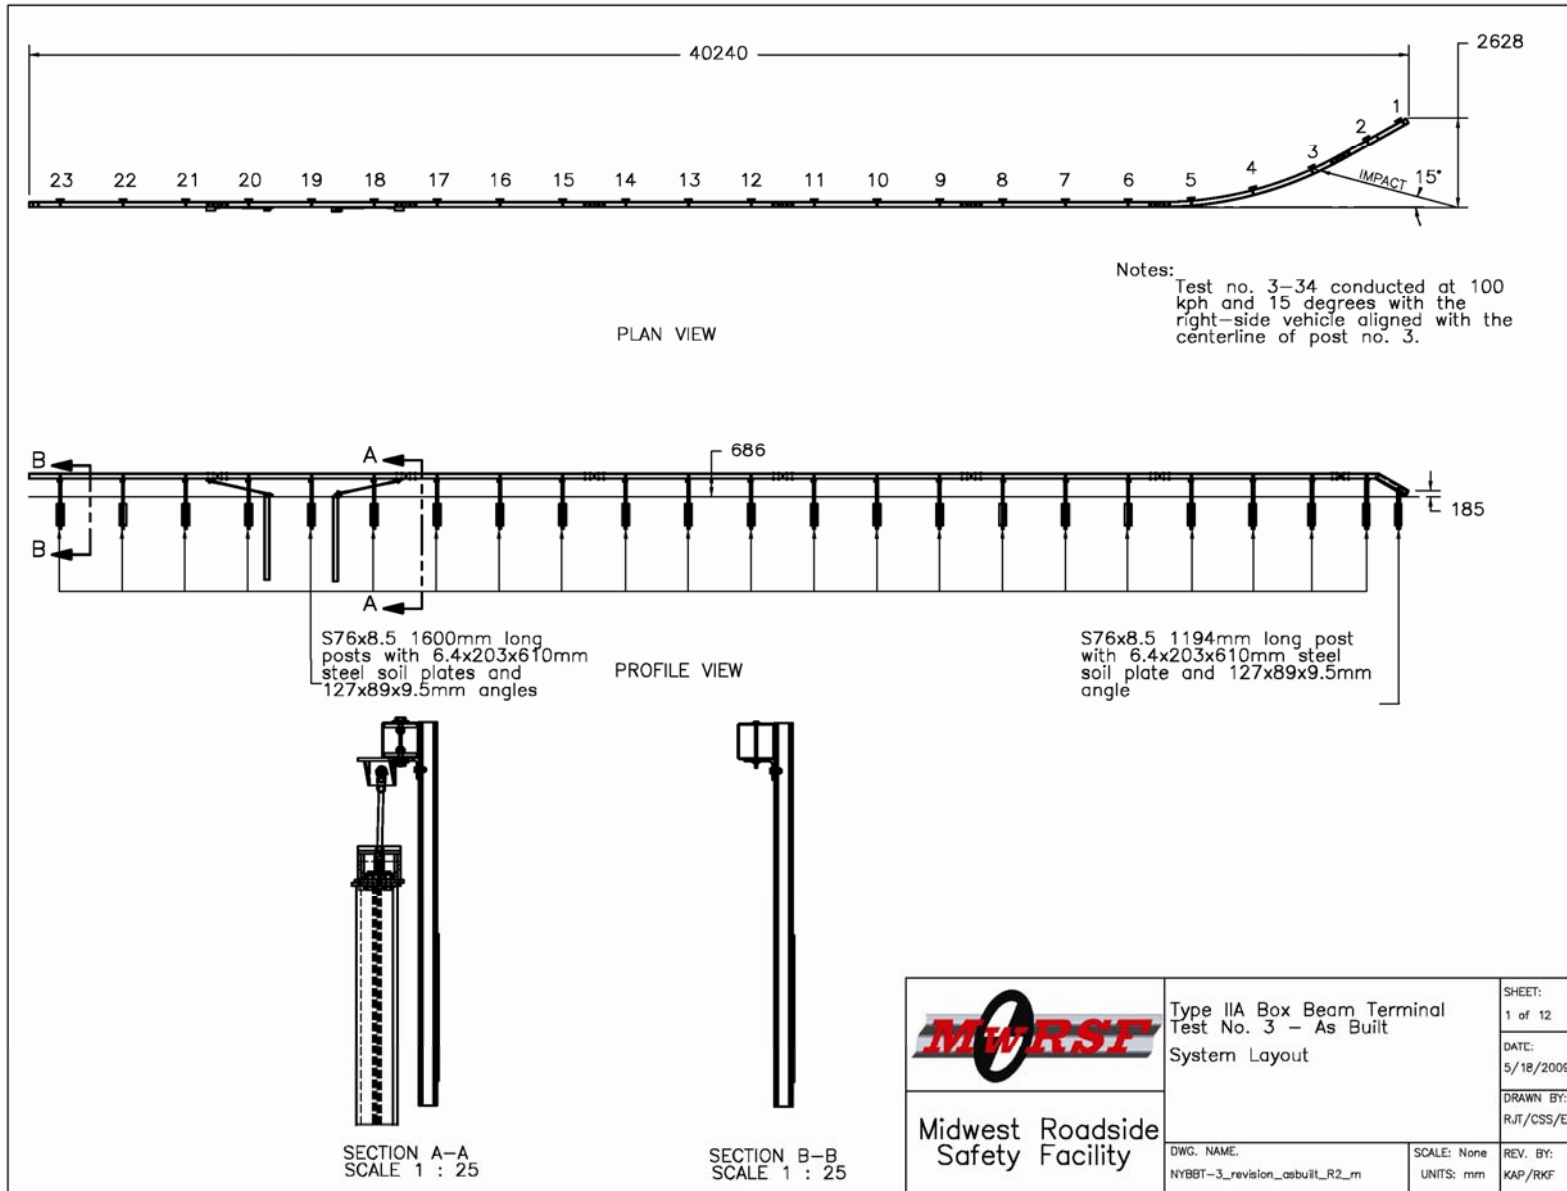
Type IIA Box Beam Terminal System Details, Test No. NYBBT-3
